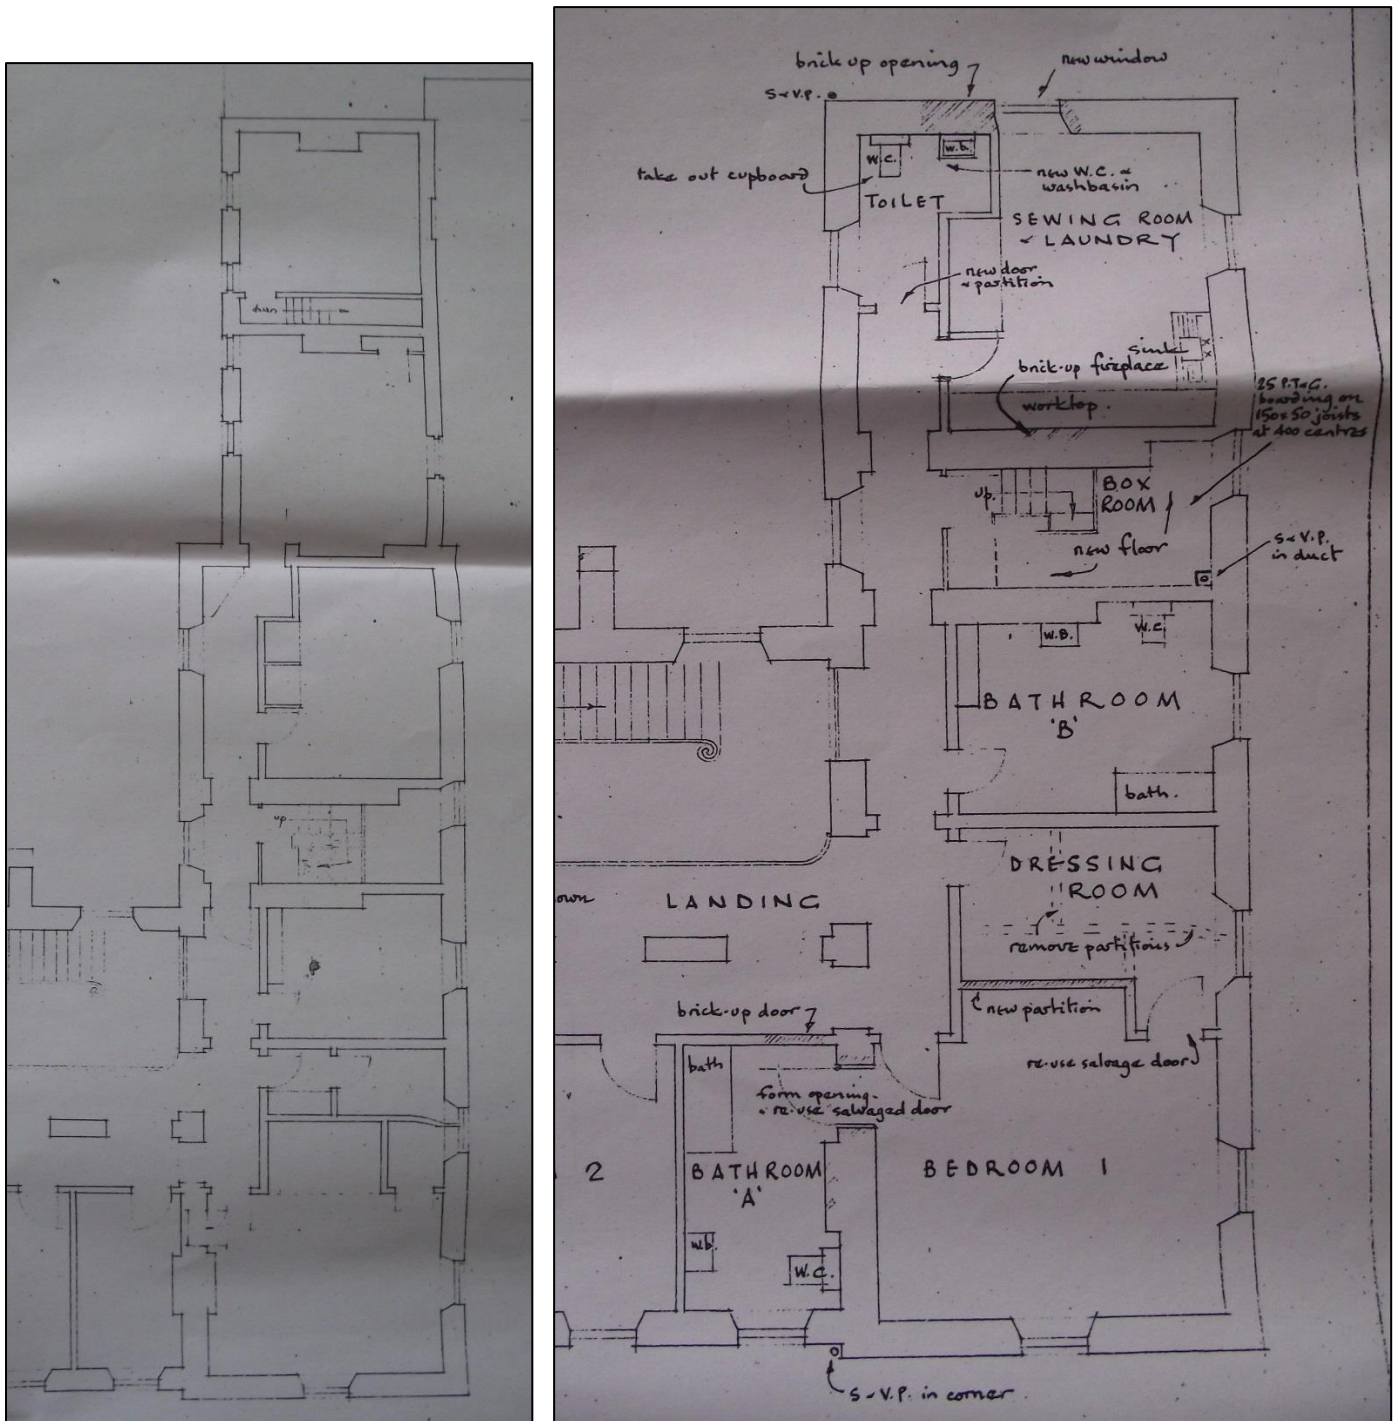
& 10: As existing (left) and as proposed (right) plans of the first floor north wing, Francis F. Johnson, 1974
